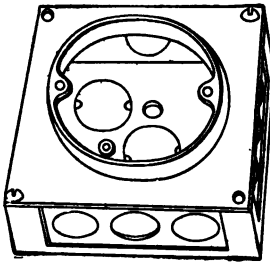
Universal and Knock-Out Type of Outlet Box.
